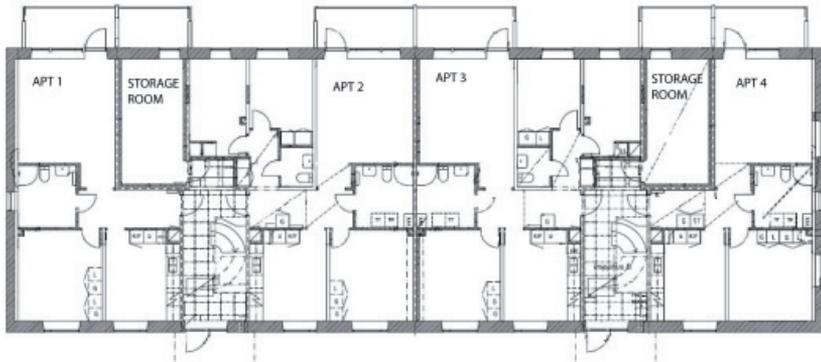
New layout on the ground floor, left stairwell (Drawing: efem arkitekter).
